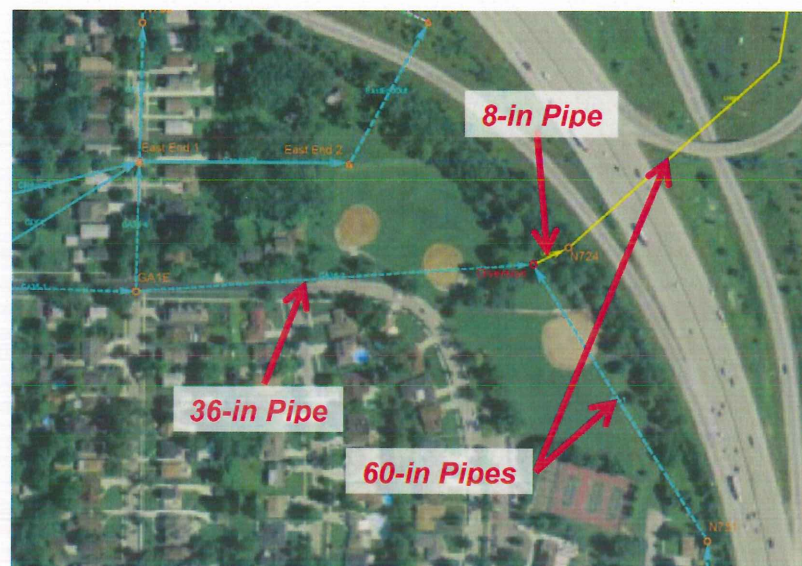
Plan View of EE Site in the CFP NCalCritical Existing Model
